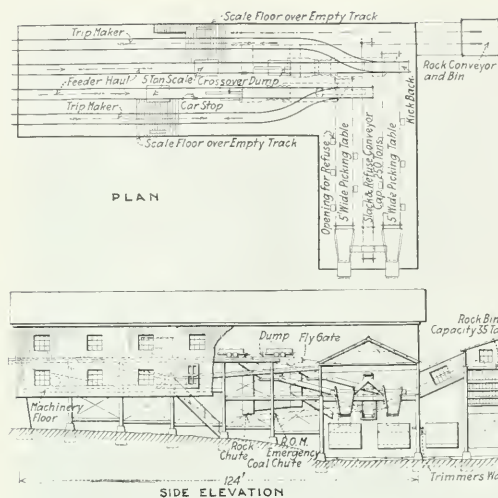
DIAGRAMMATIC PLAN, ELEVATIONS AND SECTION OF THE TIPPIE
